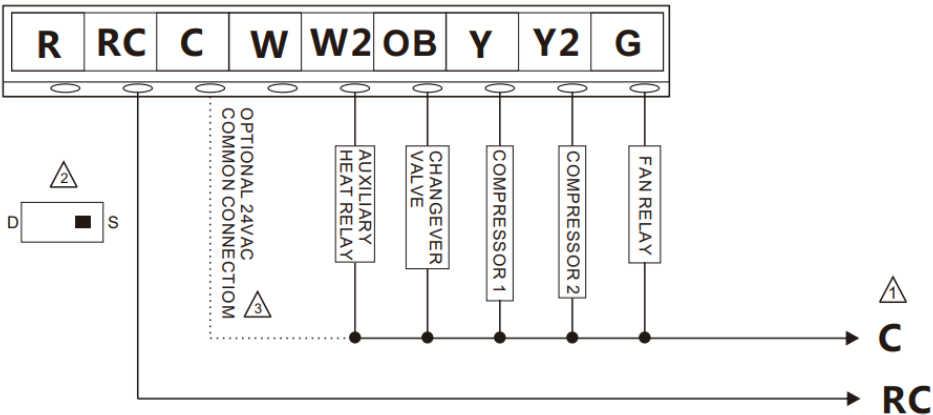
Two-stage heat & cool in heat pump (with auxiliary heat)
